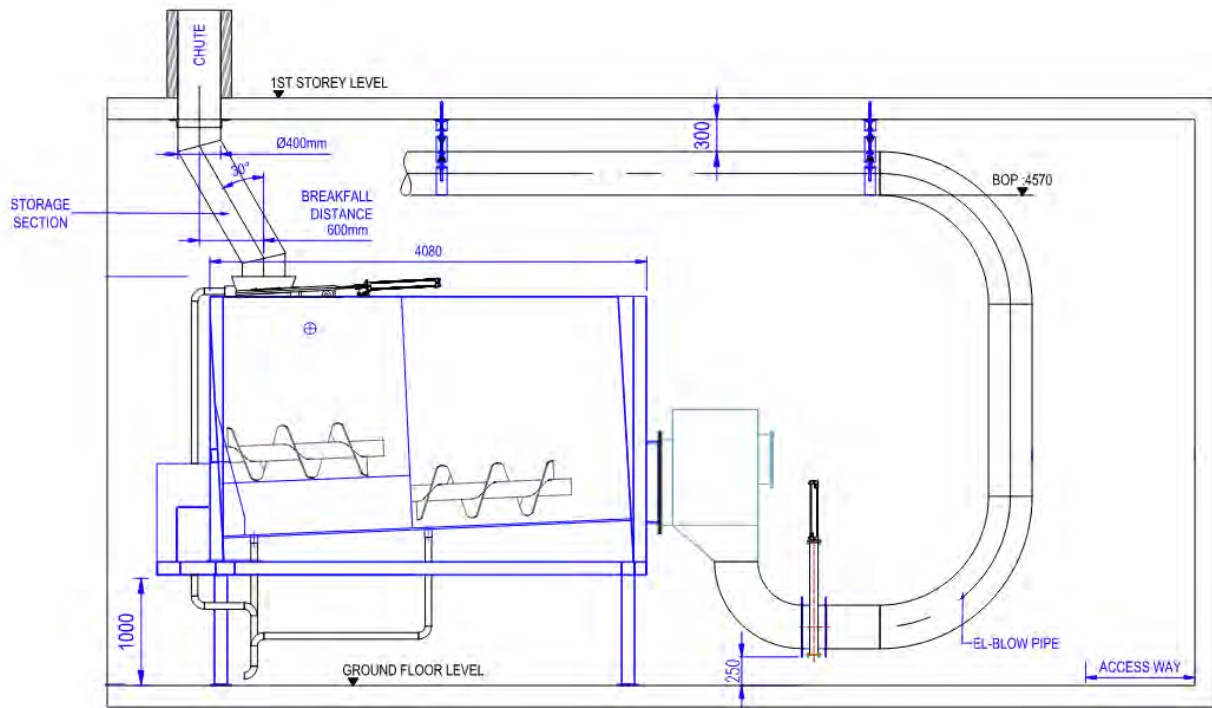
Waste Chute Connection to Storage Tank and Inlet and Discharge Valves with pipework reticulating at high level of same floor storage tanks are located (Source RVAC)
